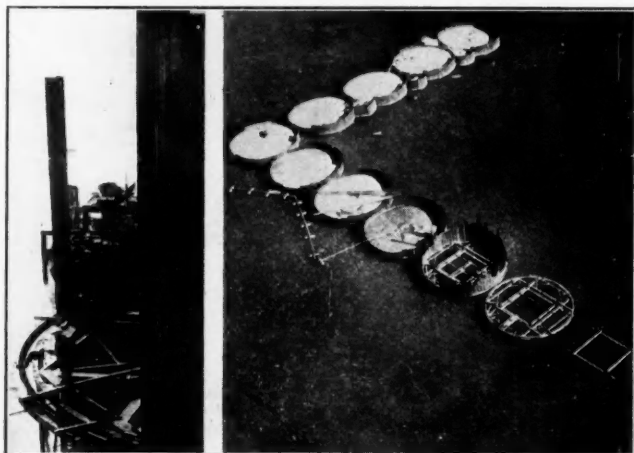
Cellular constructions of flat steel sheet piling and templates.
